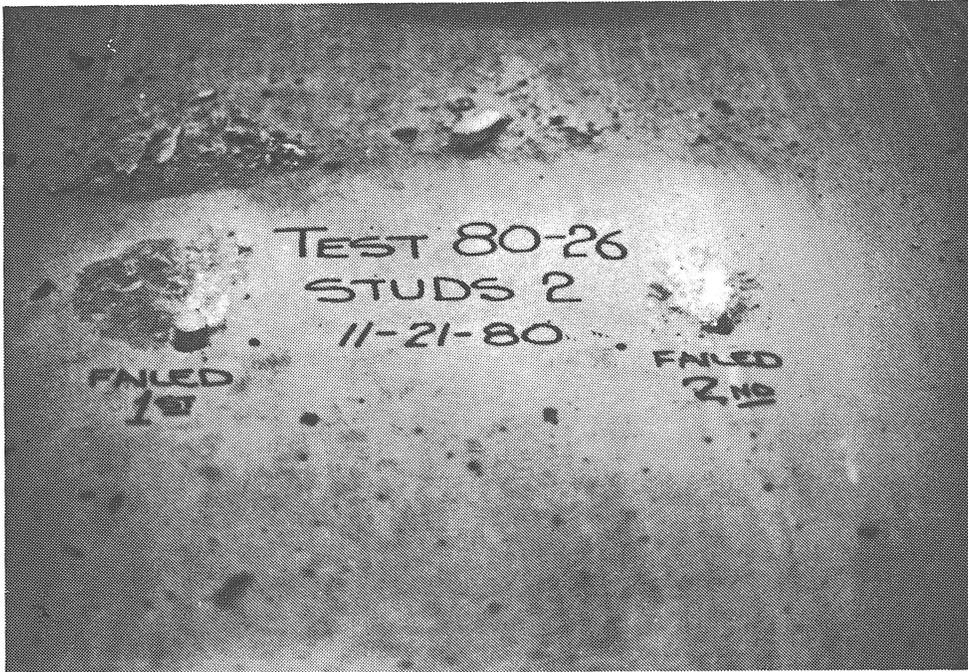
Specimen S-2. Concrete Surface After Failure of Studs
